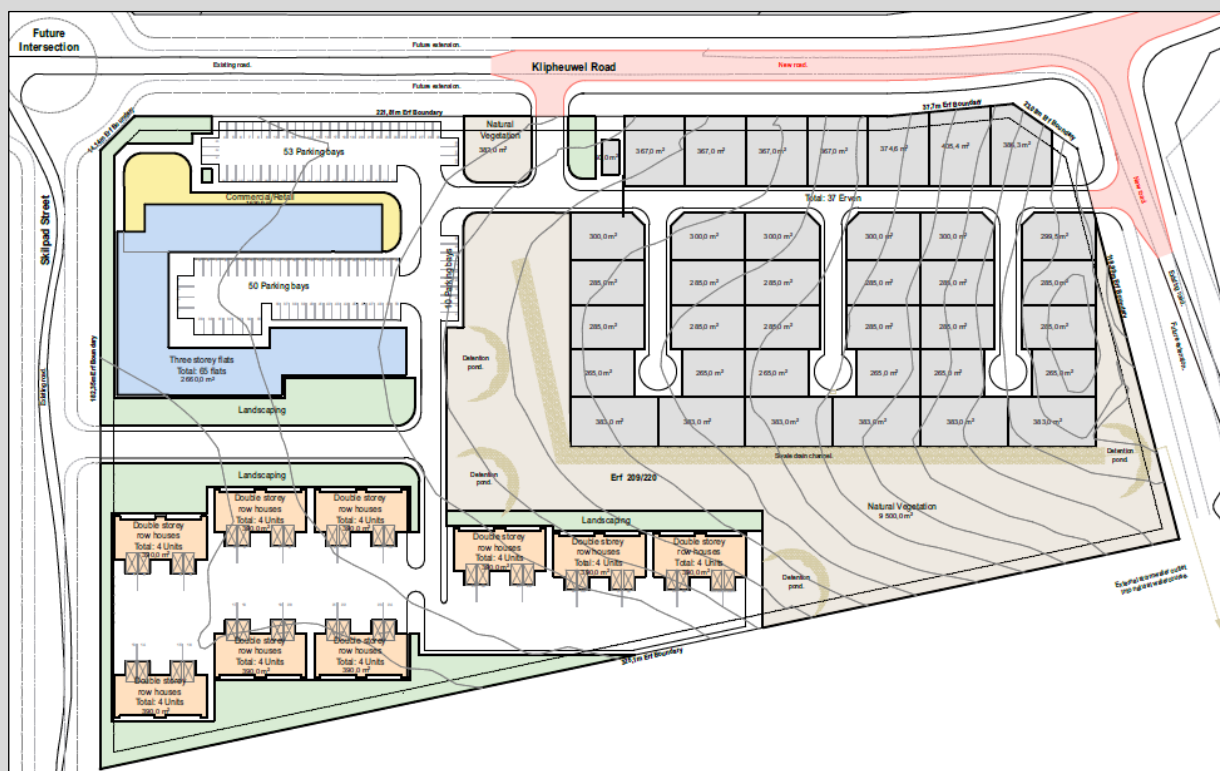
Site Development Plan for Portion 209 of Farm No. 220 (Hamilton Wessels Architects, 2023).
